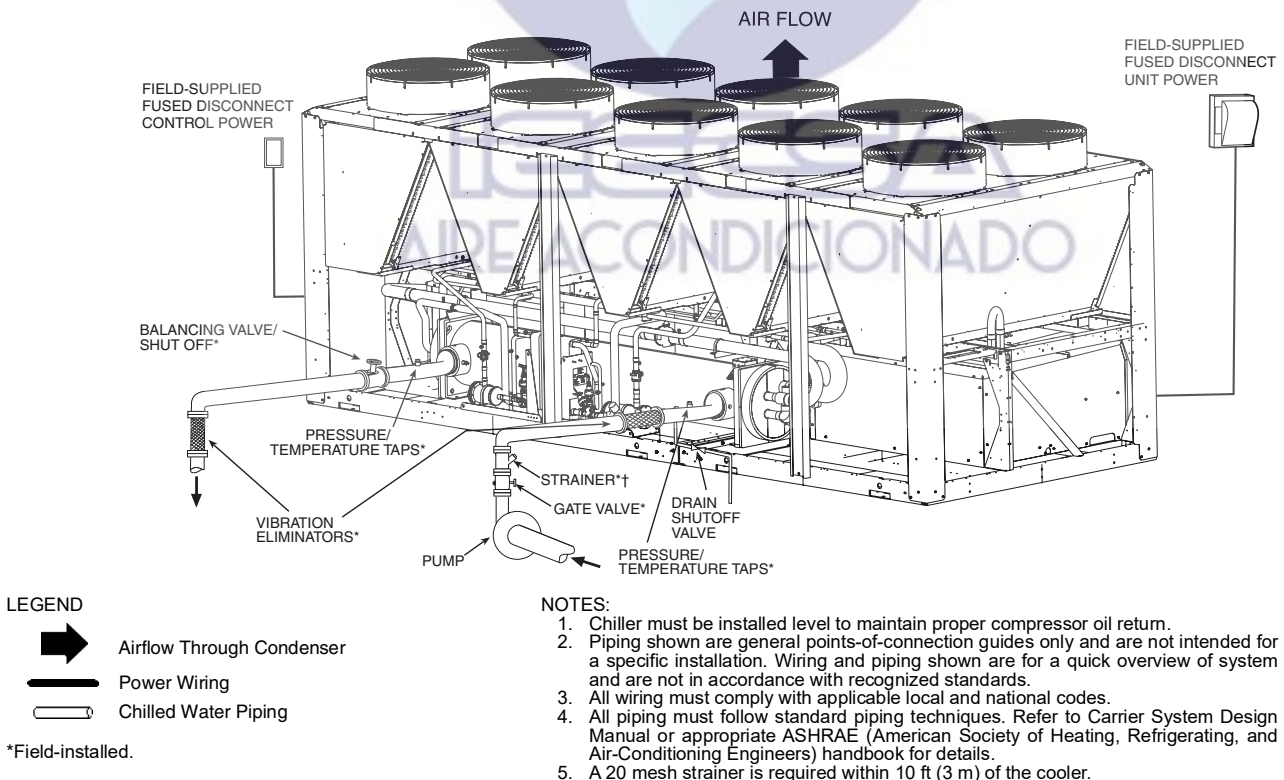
30XA Flooded Cooler Typical Piping and Wiring (Units without Hydronic Package)
